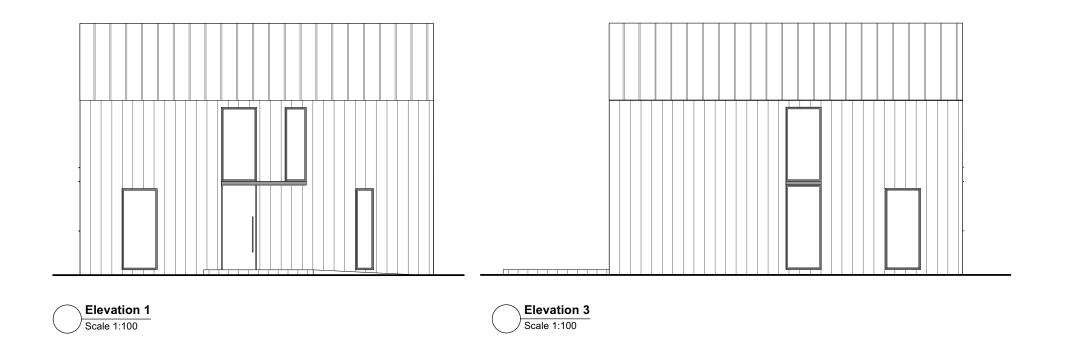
Elevations 1 & 3 (Standing seam roof version)
